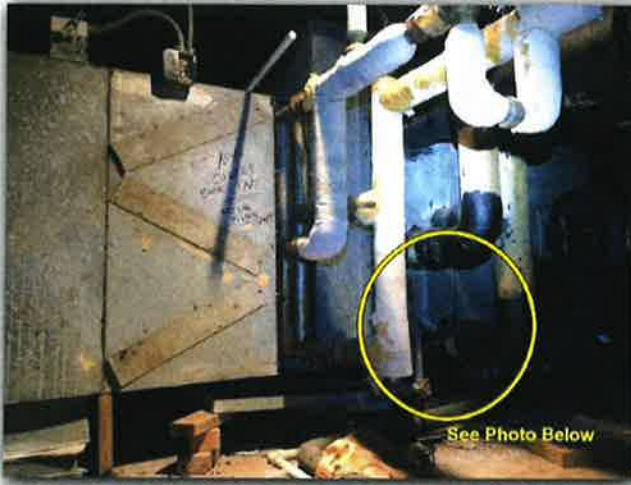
Typical view of the air handling unit serving the gym (1 of 3)
